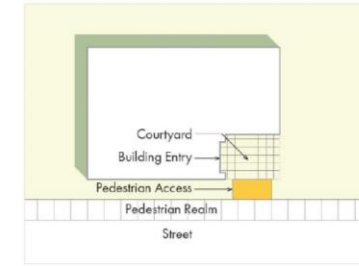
General frontage standard, Exception 2. Pedestrian accessible interior building entry.
